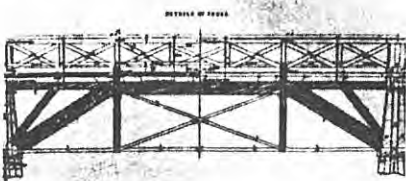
The McCallum truss was popular in America but only two sets were built in New South Wales, at Cowra in 1870 and at Casino in 1874. The untidy arrangement made construction difficult and maintenance was not an easy task.
